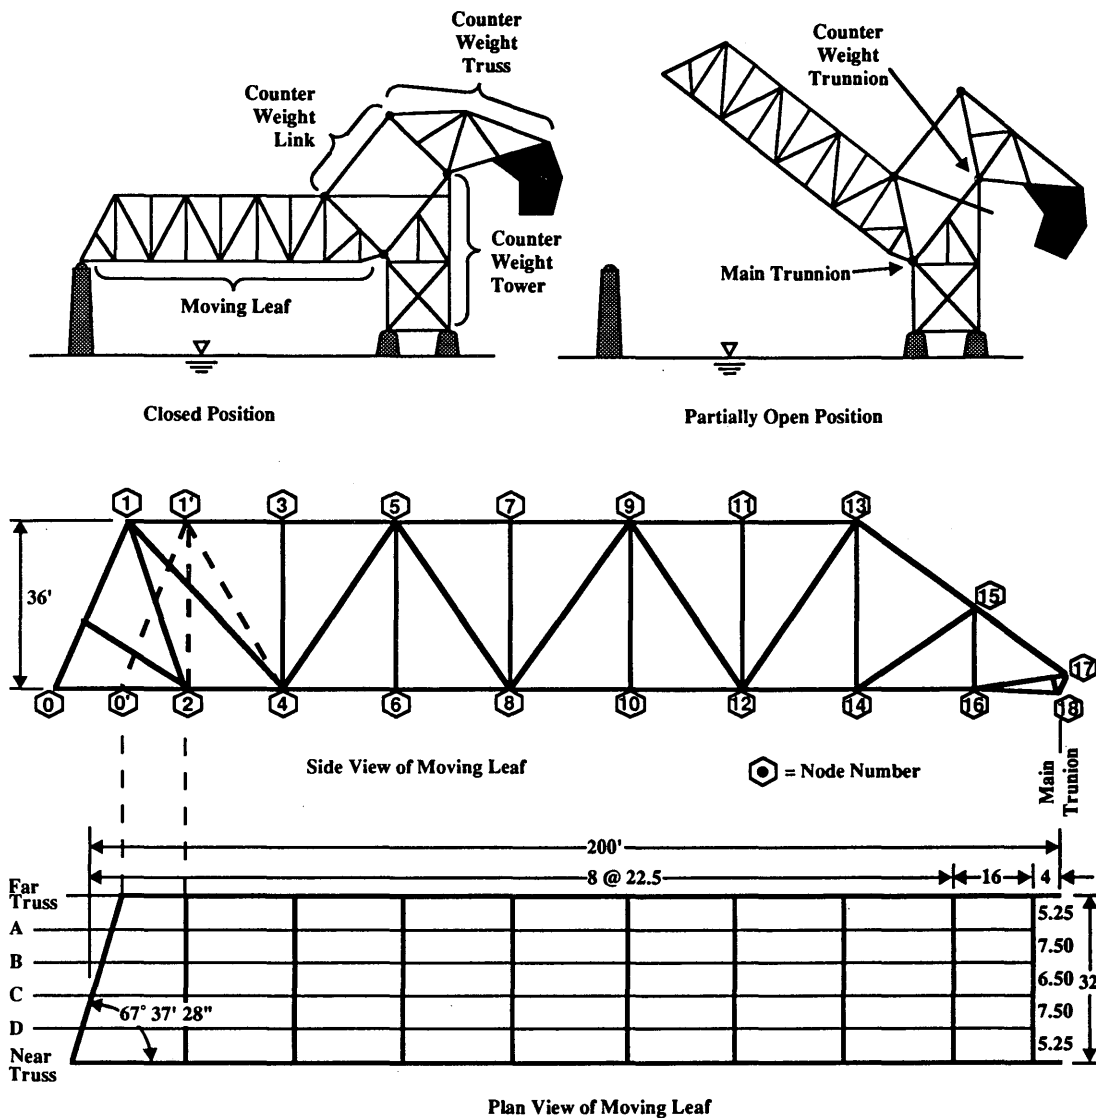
BN Bridge No. 4 (drawings not to scale).
